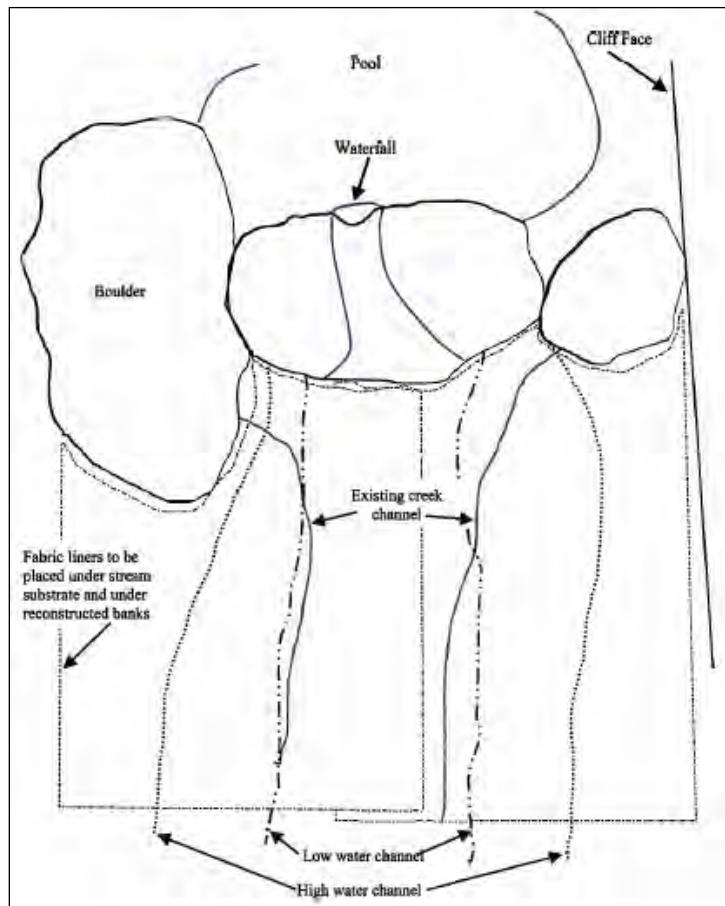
PLAN VIEW OF NATURAL BARRIER STABILIZATION.
